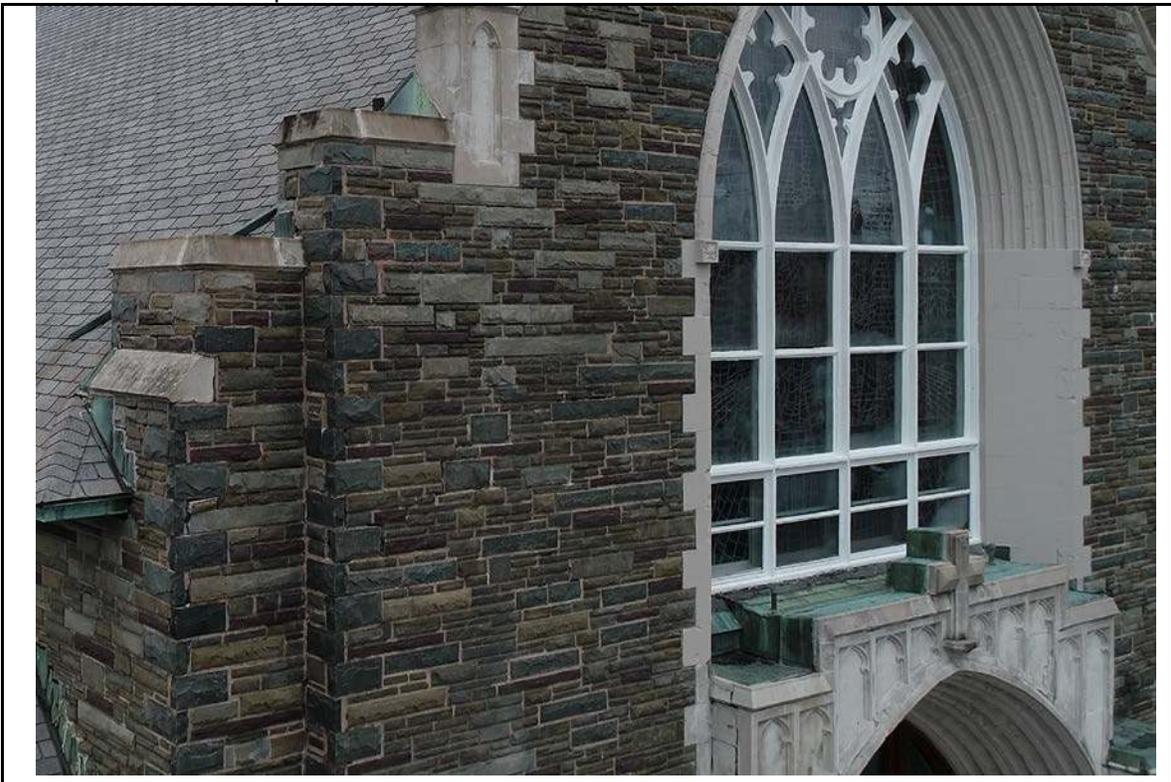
South West Transept Corner Looking East Absent And Cracked Mortar, Stones With Evidence Of Past Movement
